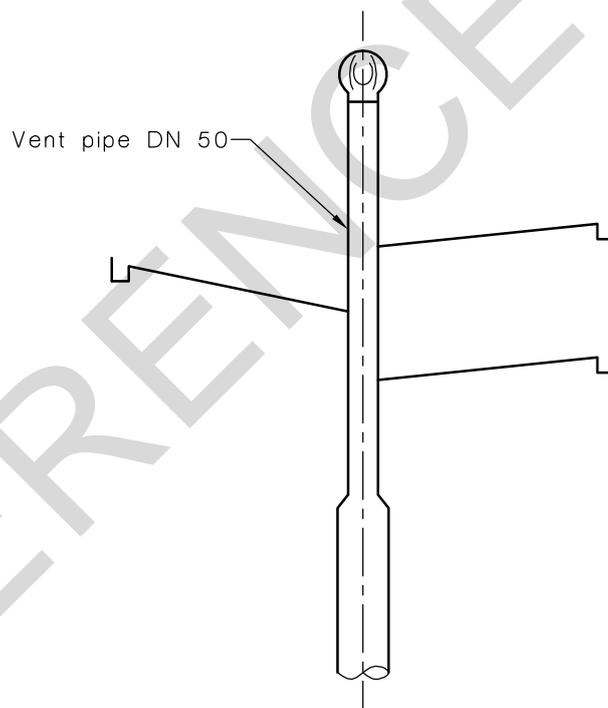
TYPICAL CONNECTION OF WASTE FIXTURES TO A DN 50 VERTICAL SECTION OF STACK
